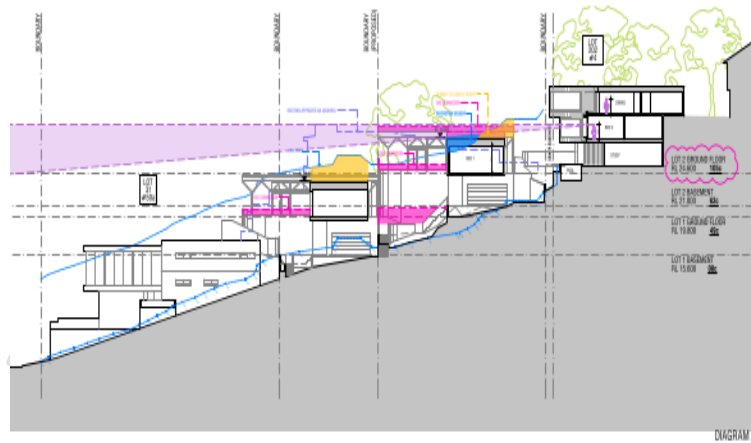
Facing North Elevation Showing No.4 Lindsay Place First Floor View.
